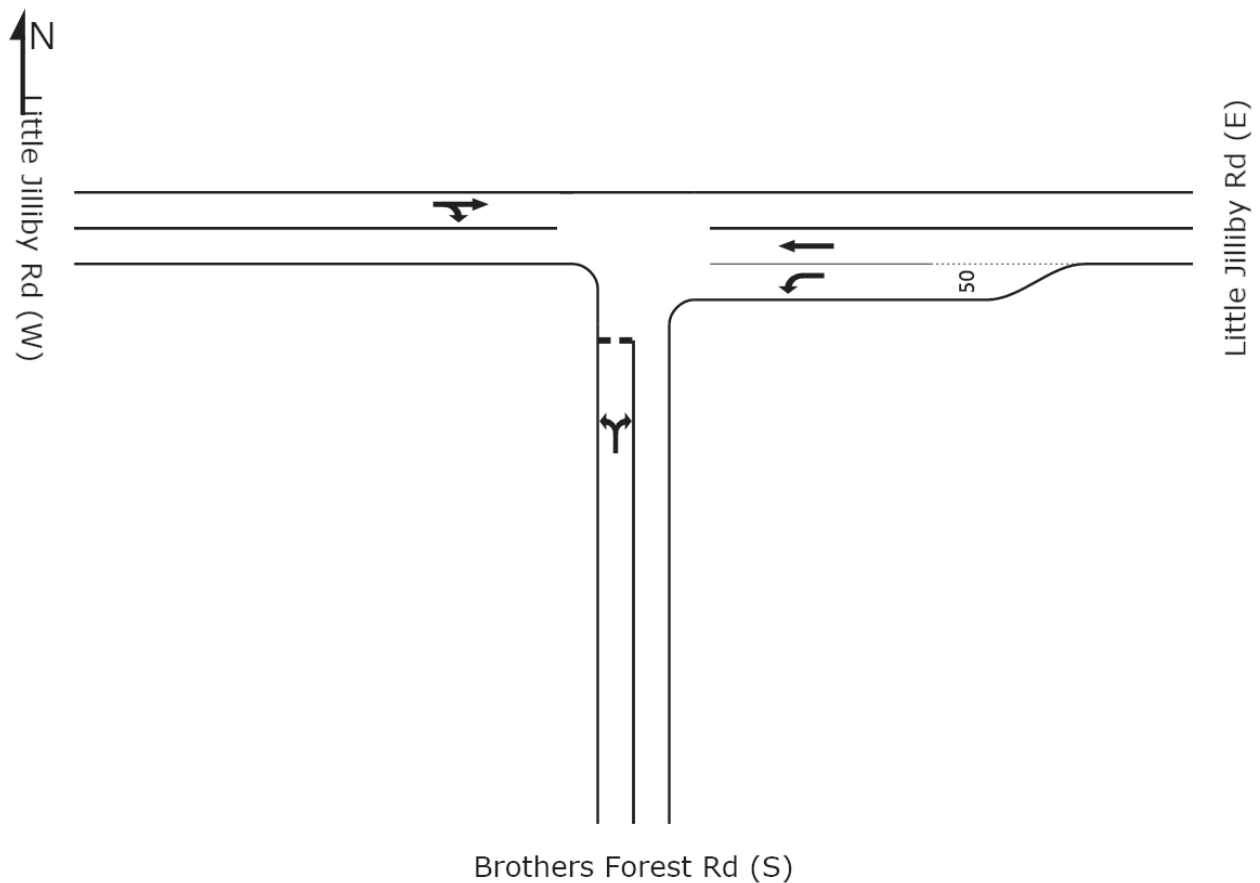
Recommended layout of the Western Ventilation Shaft Site access
